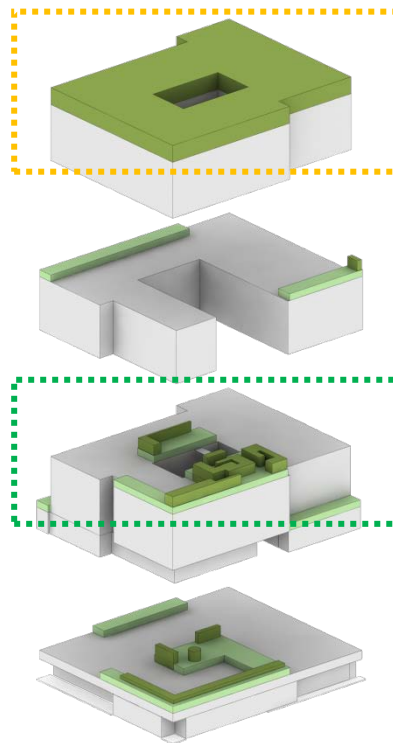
Vertical space diagram of 60 Richmond; the green roof garden (the green boxed area) on the sixth floor and a multi-vegetation green roof (the orange boxed area) on the top of the roof (Source: Bozikovic, 2010).
